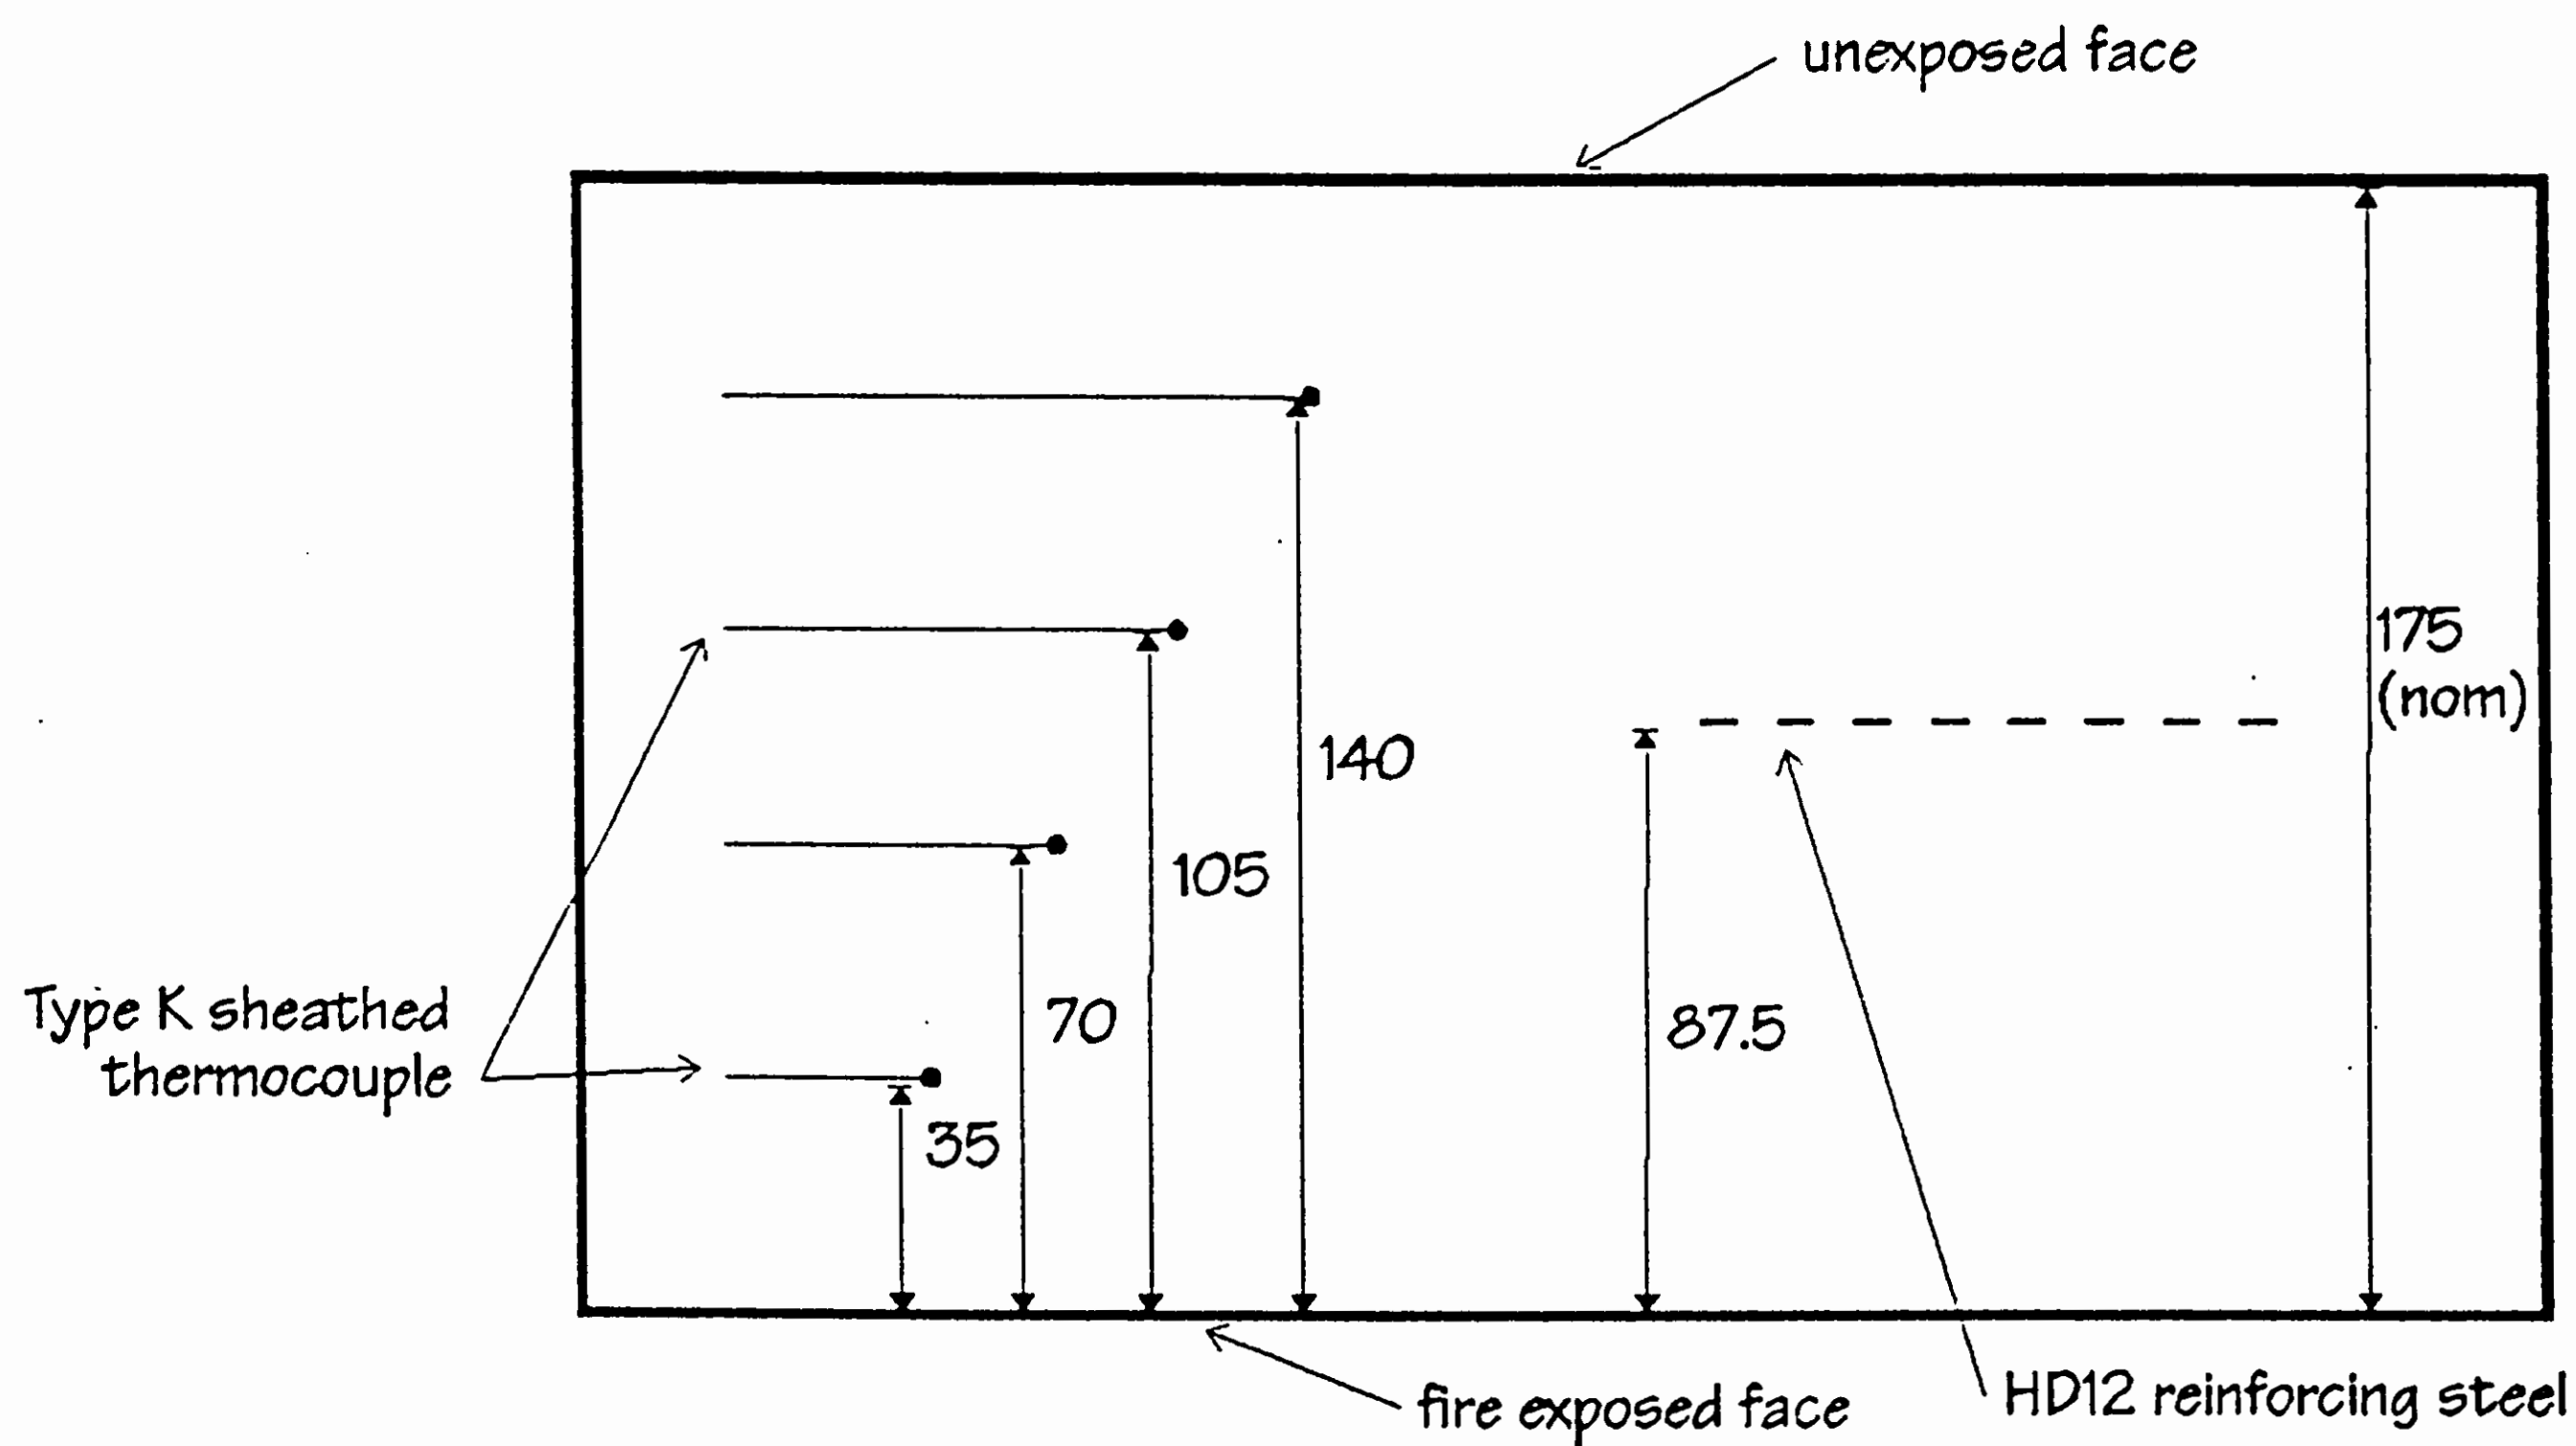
Cross-section Through 175 mm Slabs Showing Location of Thermocouples and Reinforcement
